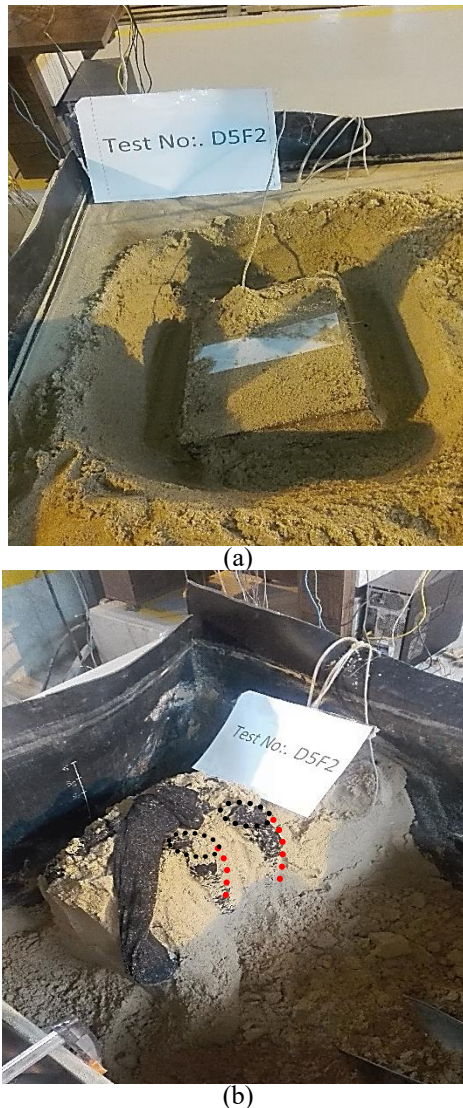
bulging and foundation settlement on the GD columns (a,b)
